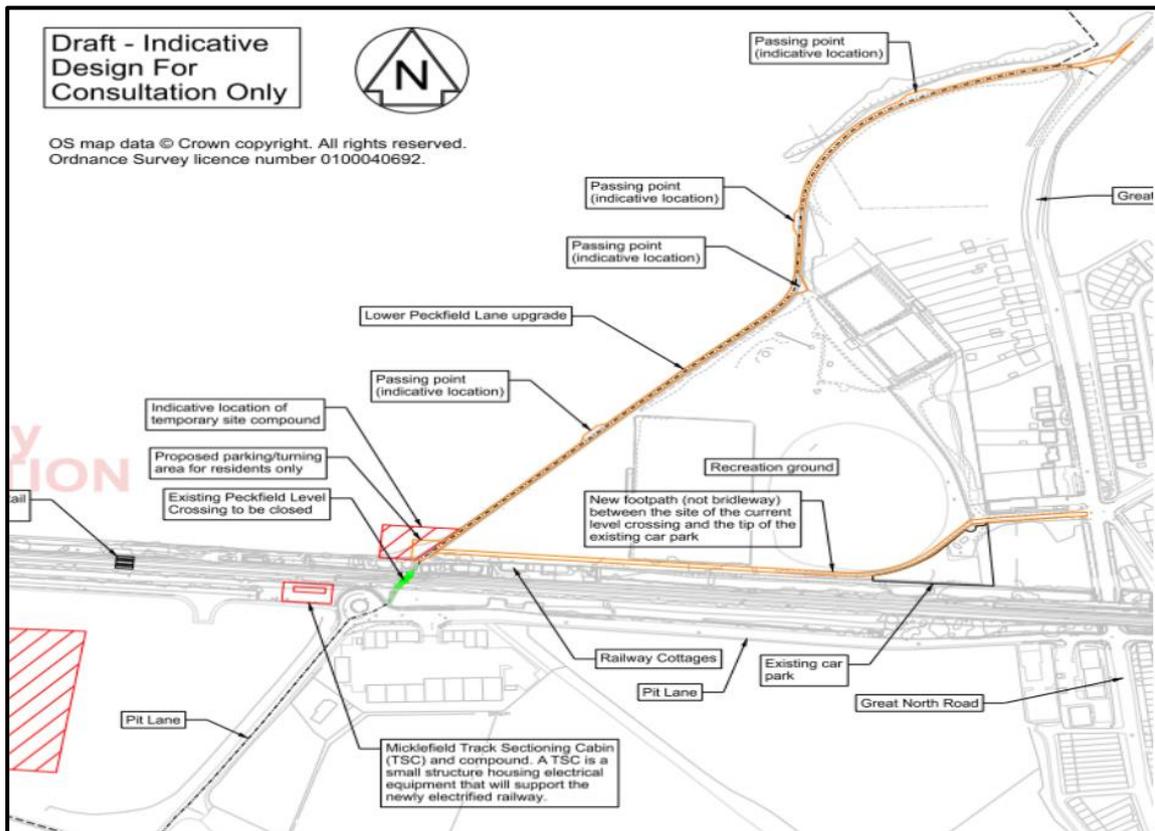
Option 1 – New footpath (or bridleway) through Recreation Ground and Lower Peckfield Lane north of railway improvements
